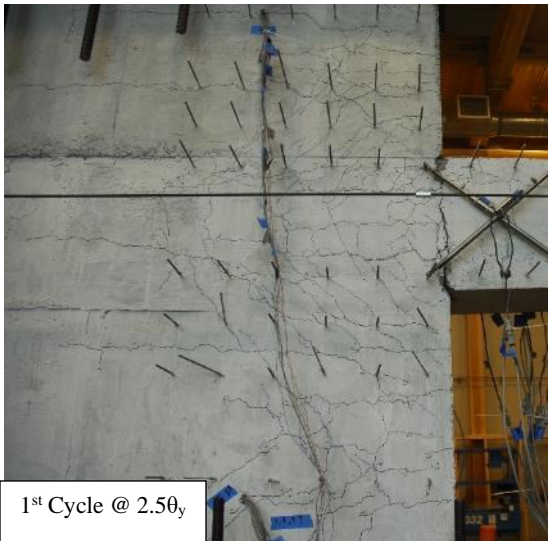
Wall Damage Photos for SRC-W2 (continued)
